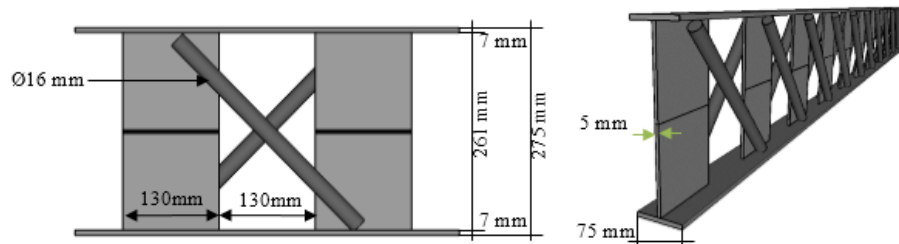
Full height rectangular opening castellated steel beam with diagonal stiffener
